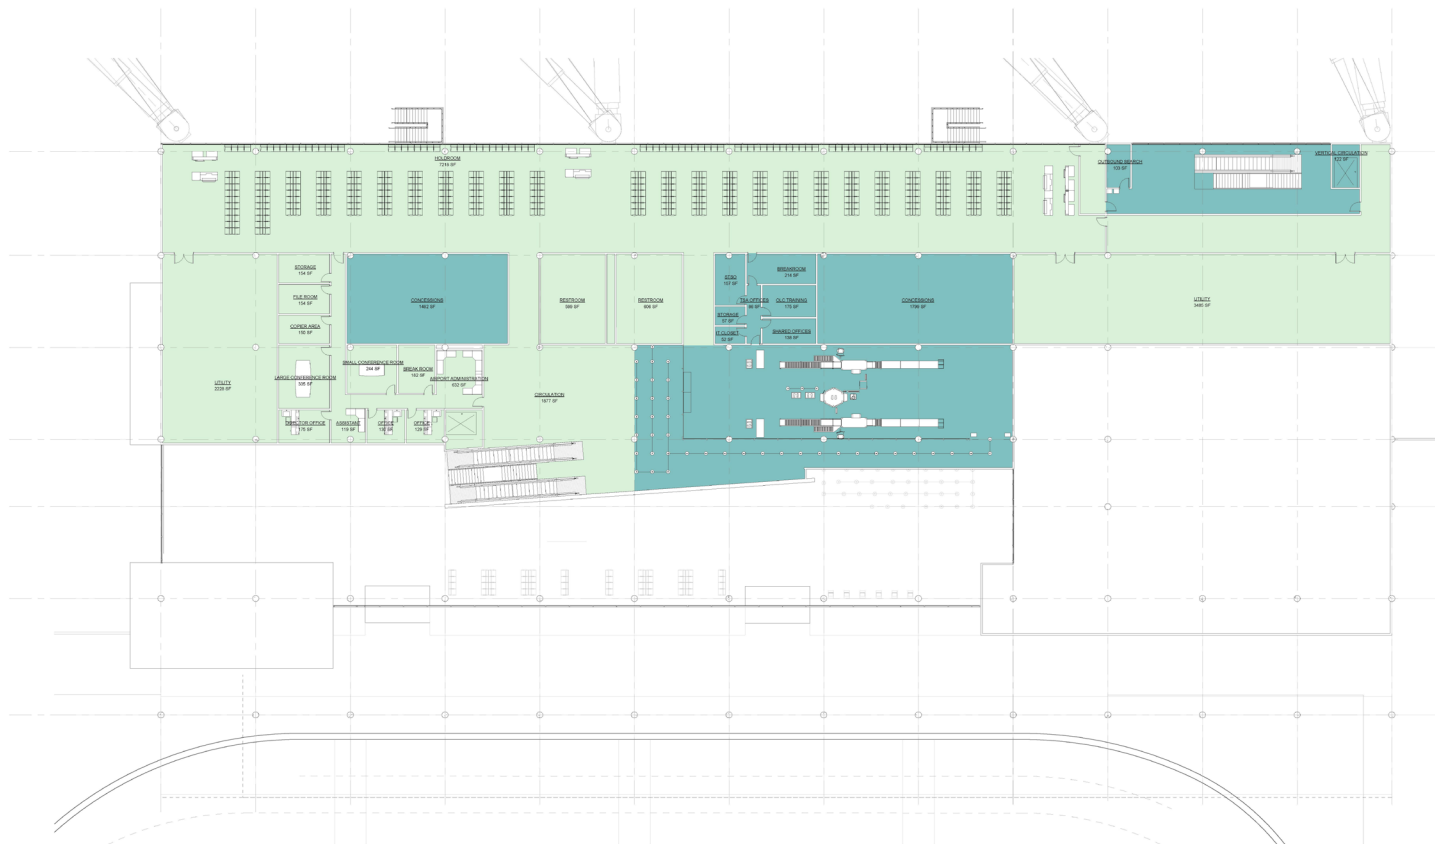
Terminal Building Floor Plan (Second Floor)
